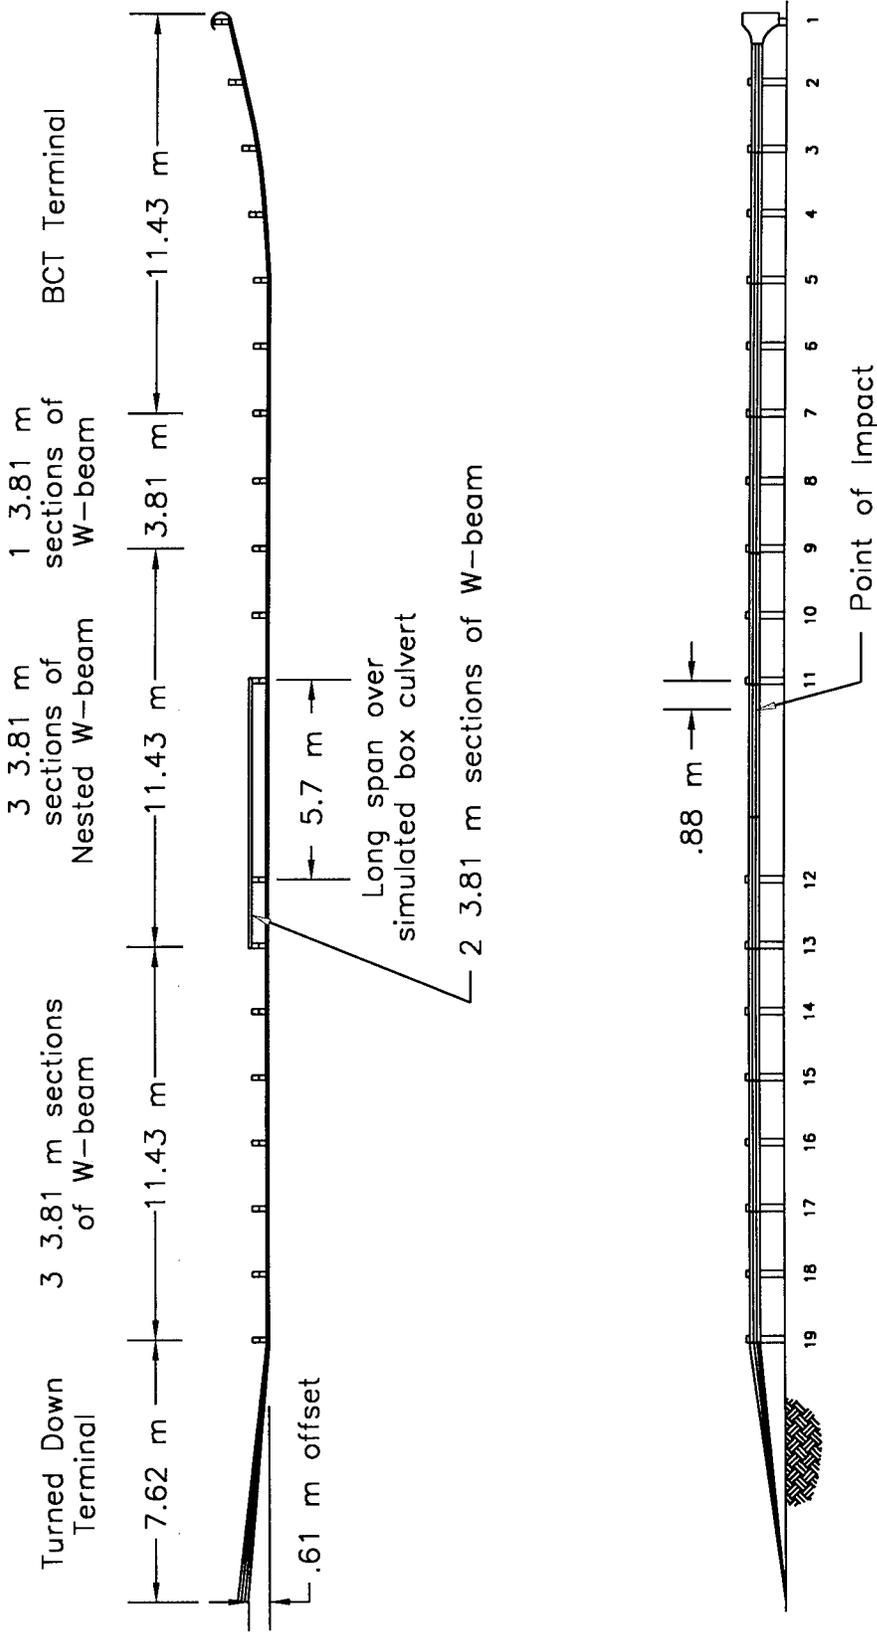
Details of Washington nested W-beam wood-post guardrail with two posts over culvert for test 7147-4.
